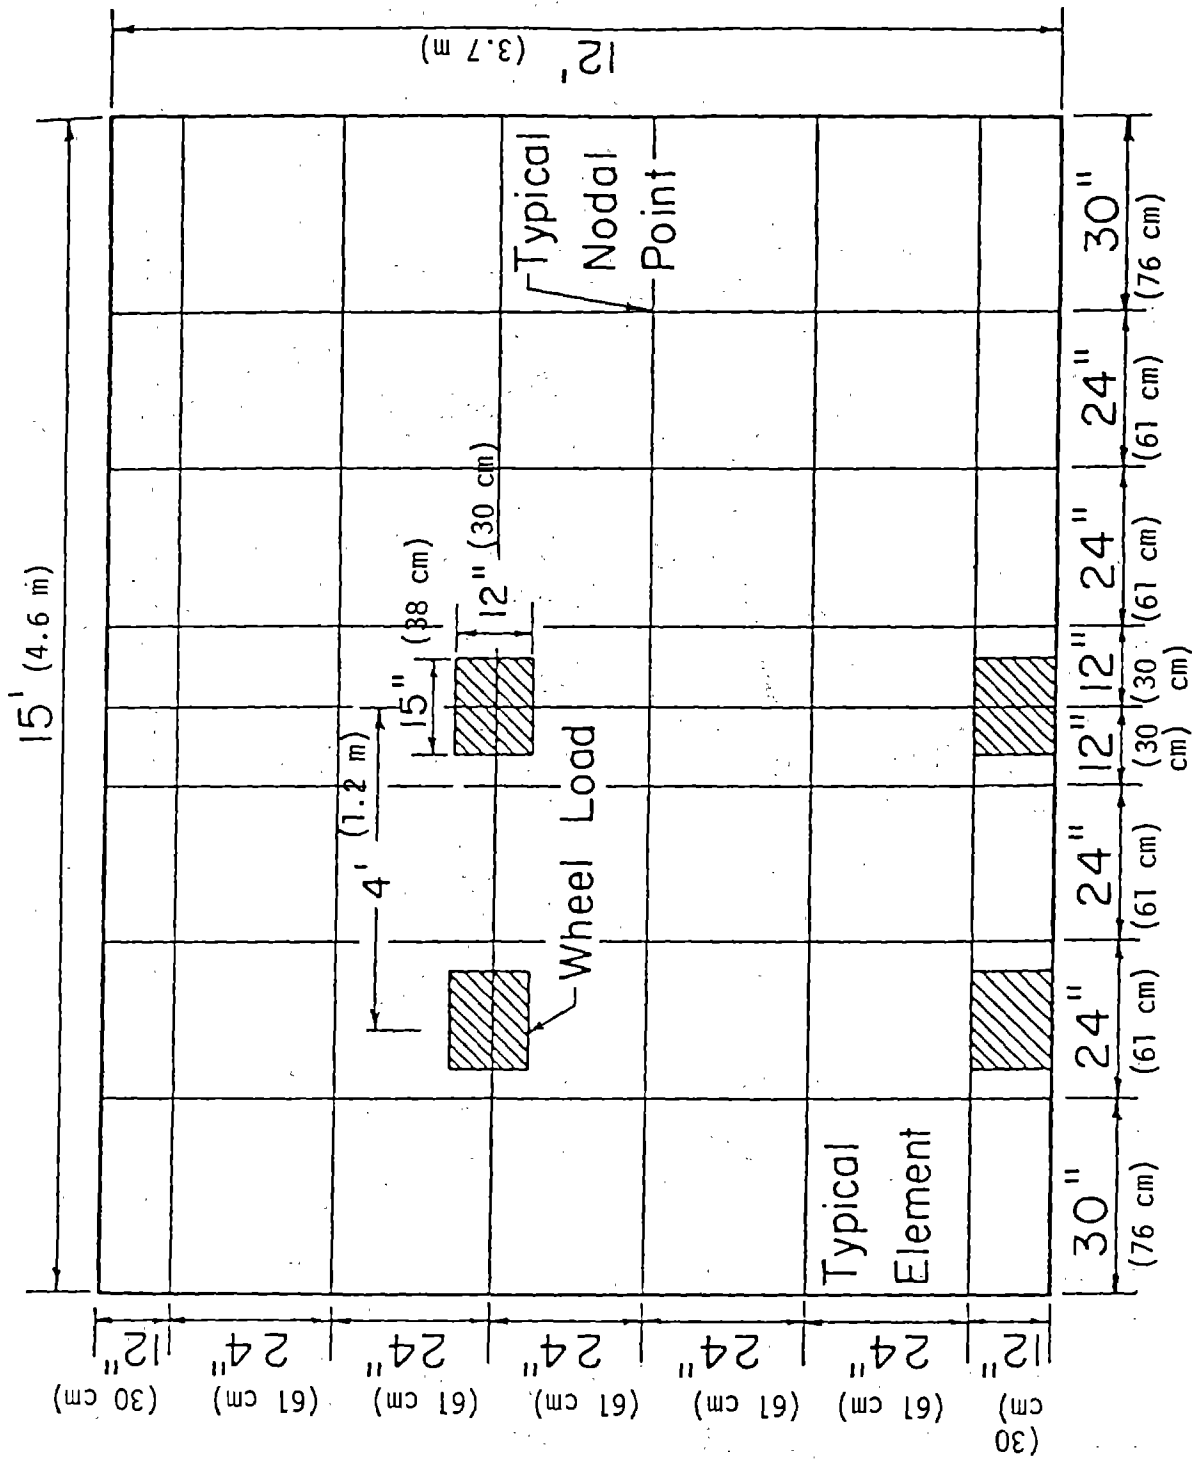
Finite Element Slab Layout for Tandem Axle Load.
